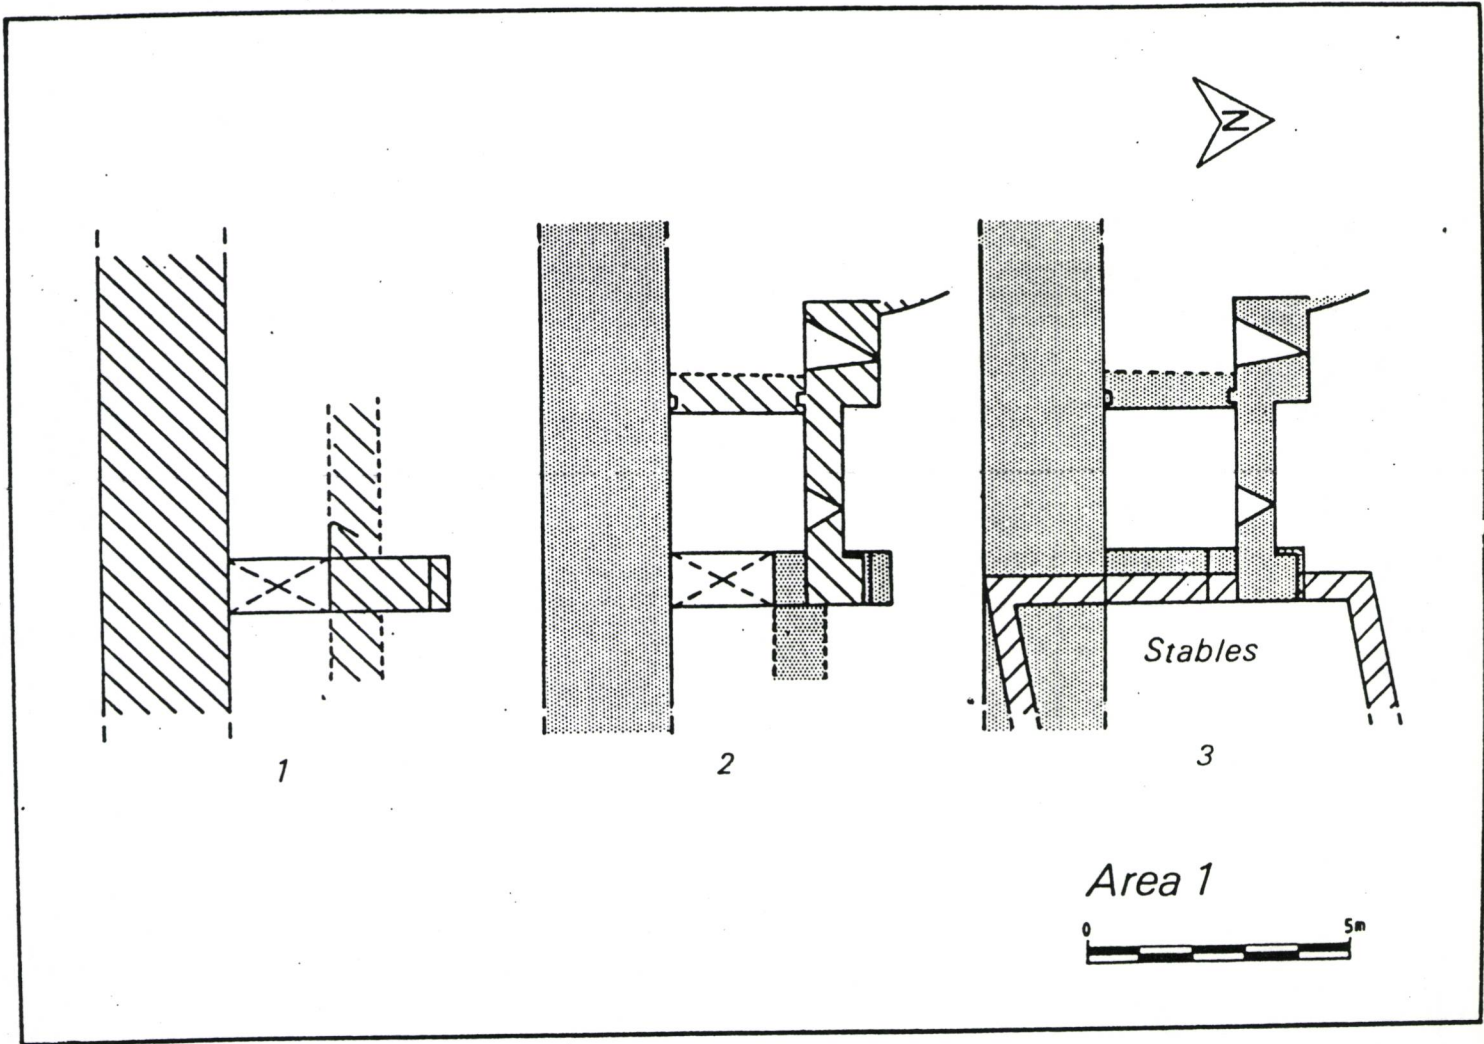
Area 1 Development of Entrance Arrangements (see location plan).
